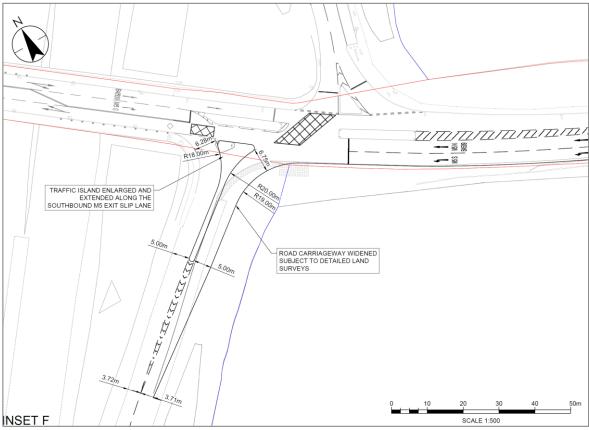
Proposed mitigation extending the physical traffic splitter island, and associated carriageway widening on the southbound entry slip road
